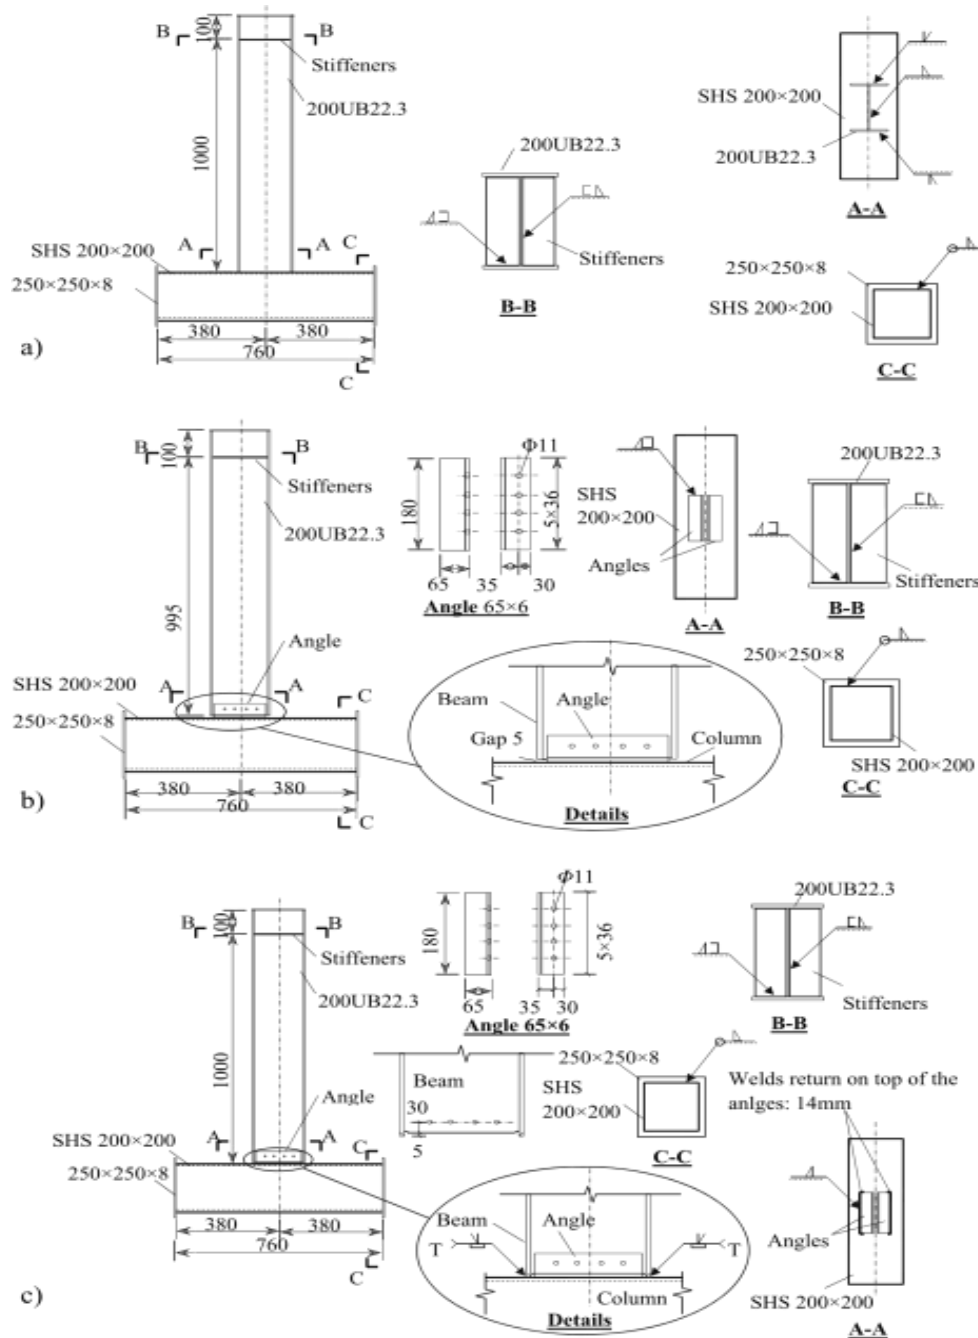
Configuration details of steel I-beam to hollow square column connections (Unit: mm)
